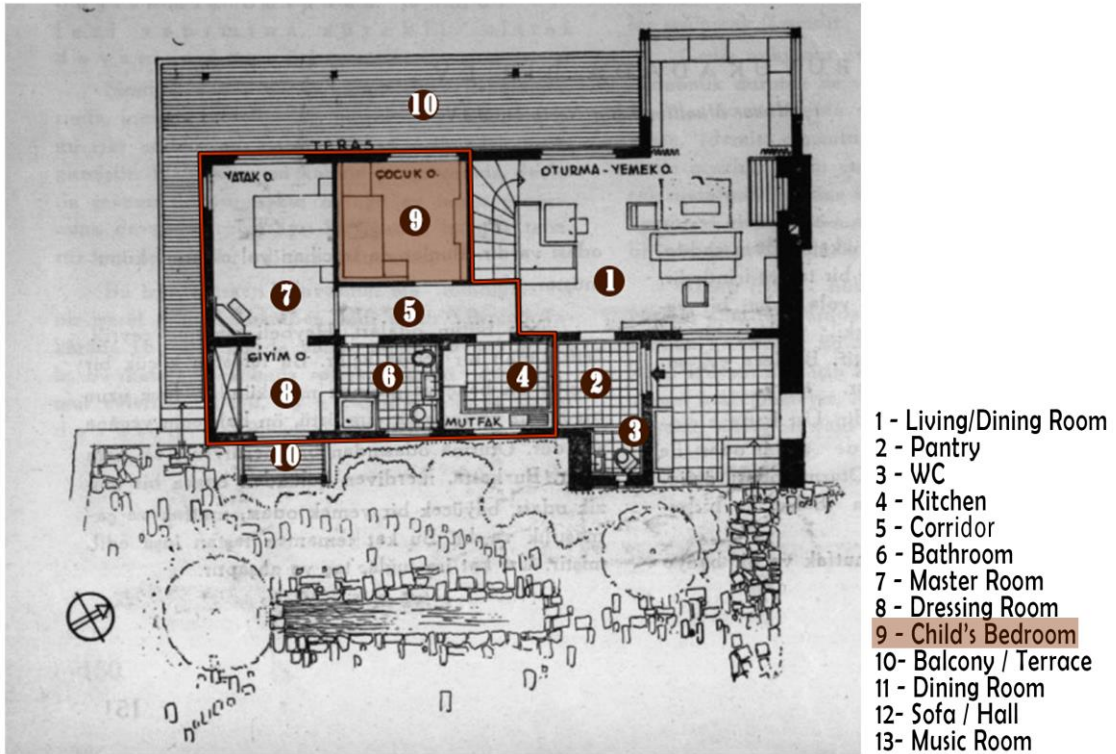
The first floor plan of a house in Büyükkada, İstanbul (*Arkitekt*, 1946, 7-8)
